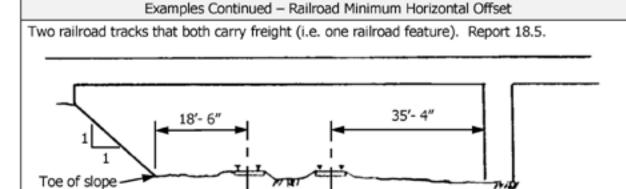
Bridge elevation view indicating horizontal offset for two railroad tracks below the bridge.
